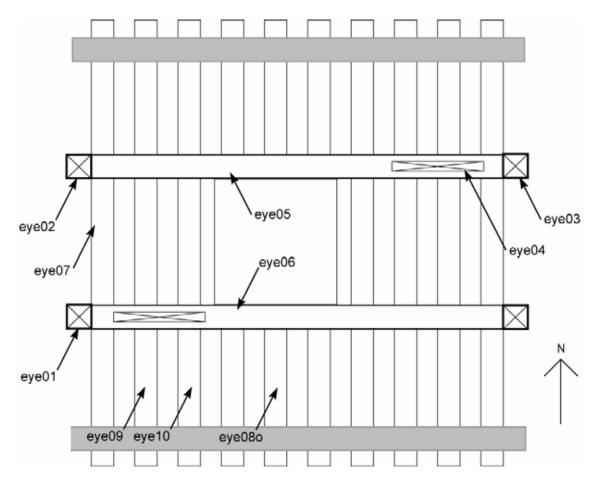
Plan of the belfry floor, from below, showing the positions of the sampled timbers; shaded beams are in concrete
